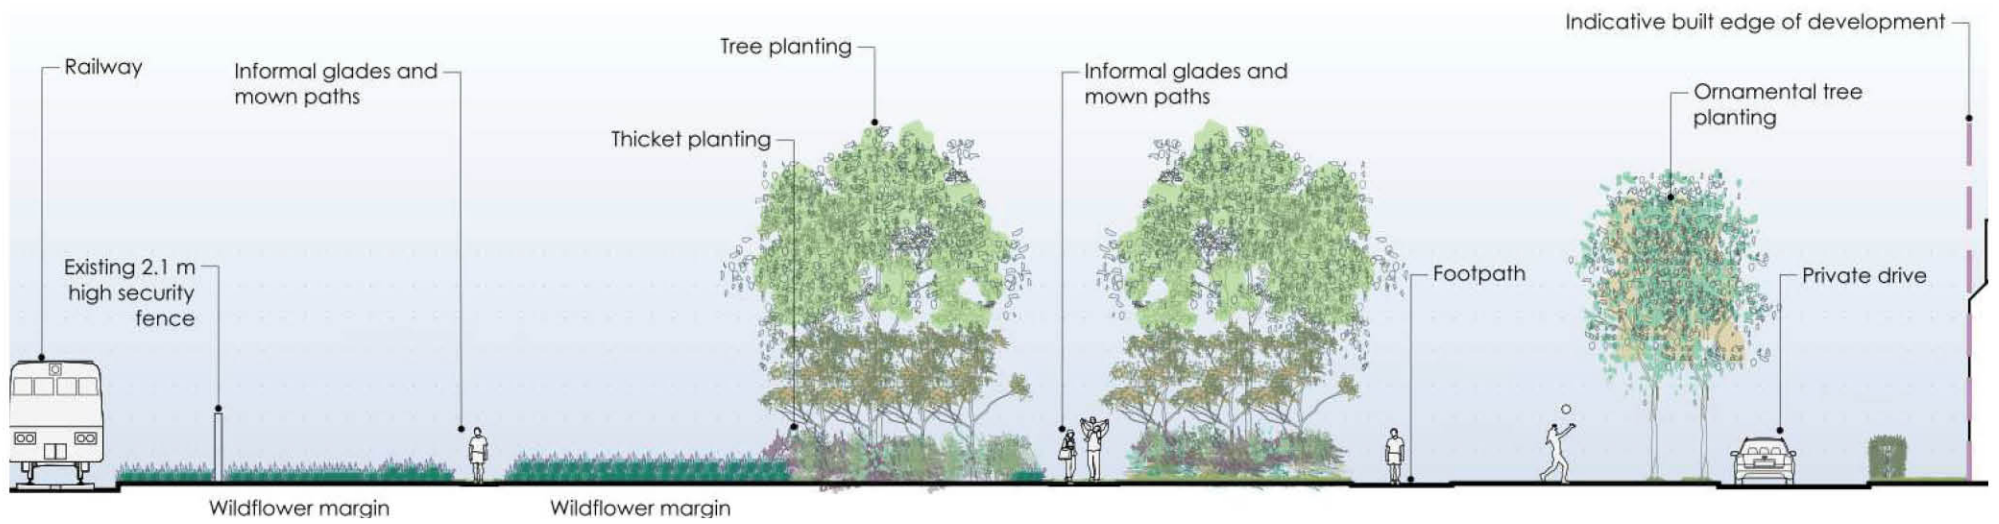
Illustrative Landscape Section D-DD Section Through Open Space at Western Boundary
